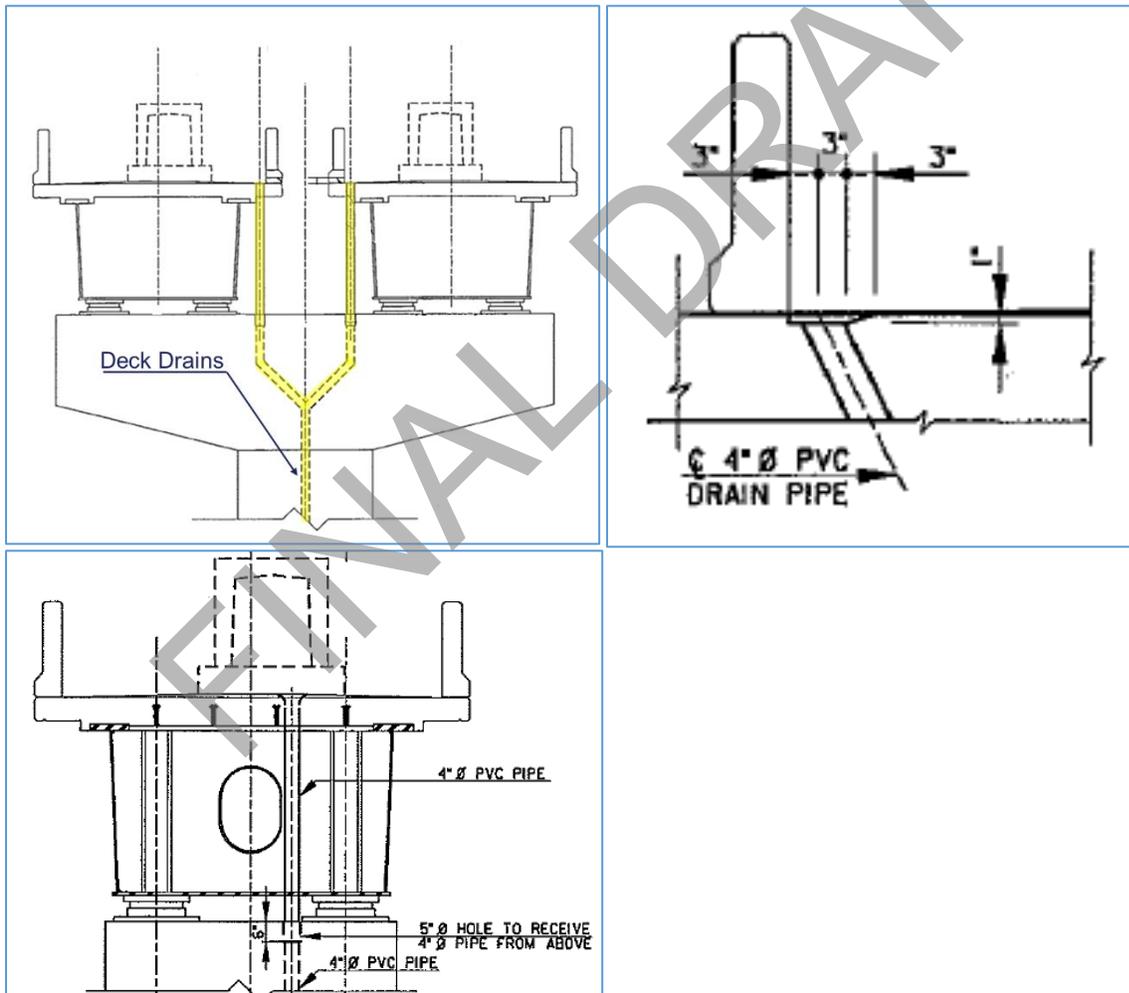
TYPICAL DECK DRAINAGE DETAILS
